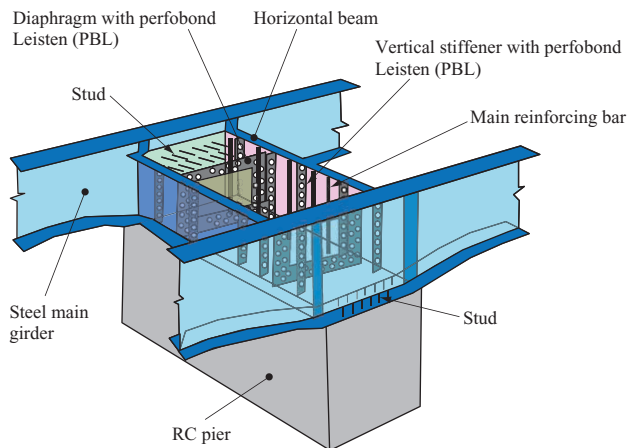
Schematic view of the rigid connections between a reinforced concrete pier and a steel beam
